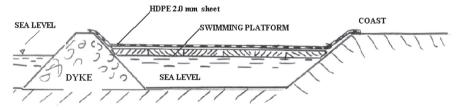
Laying of HDPE sheet over the swimming platform. Welding and testing of HDPE liner.
